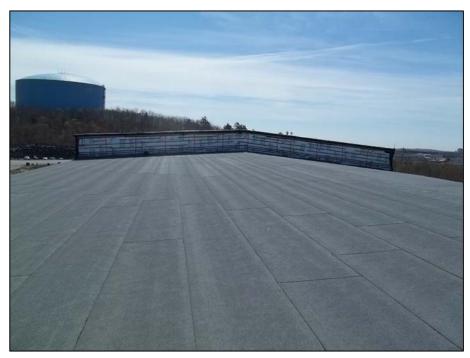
OVERVIEW OF CURING AREA ROOF
